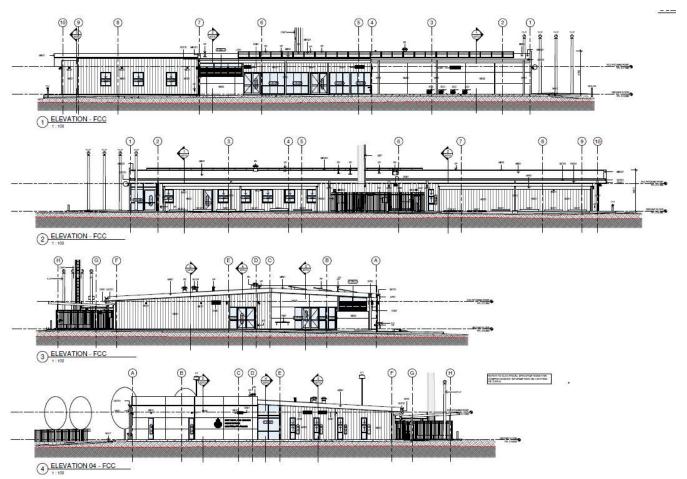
Fire Control Centre Elevations (NBRS, 28 September 2023)
